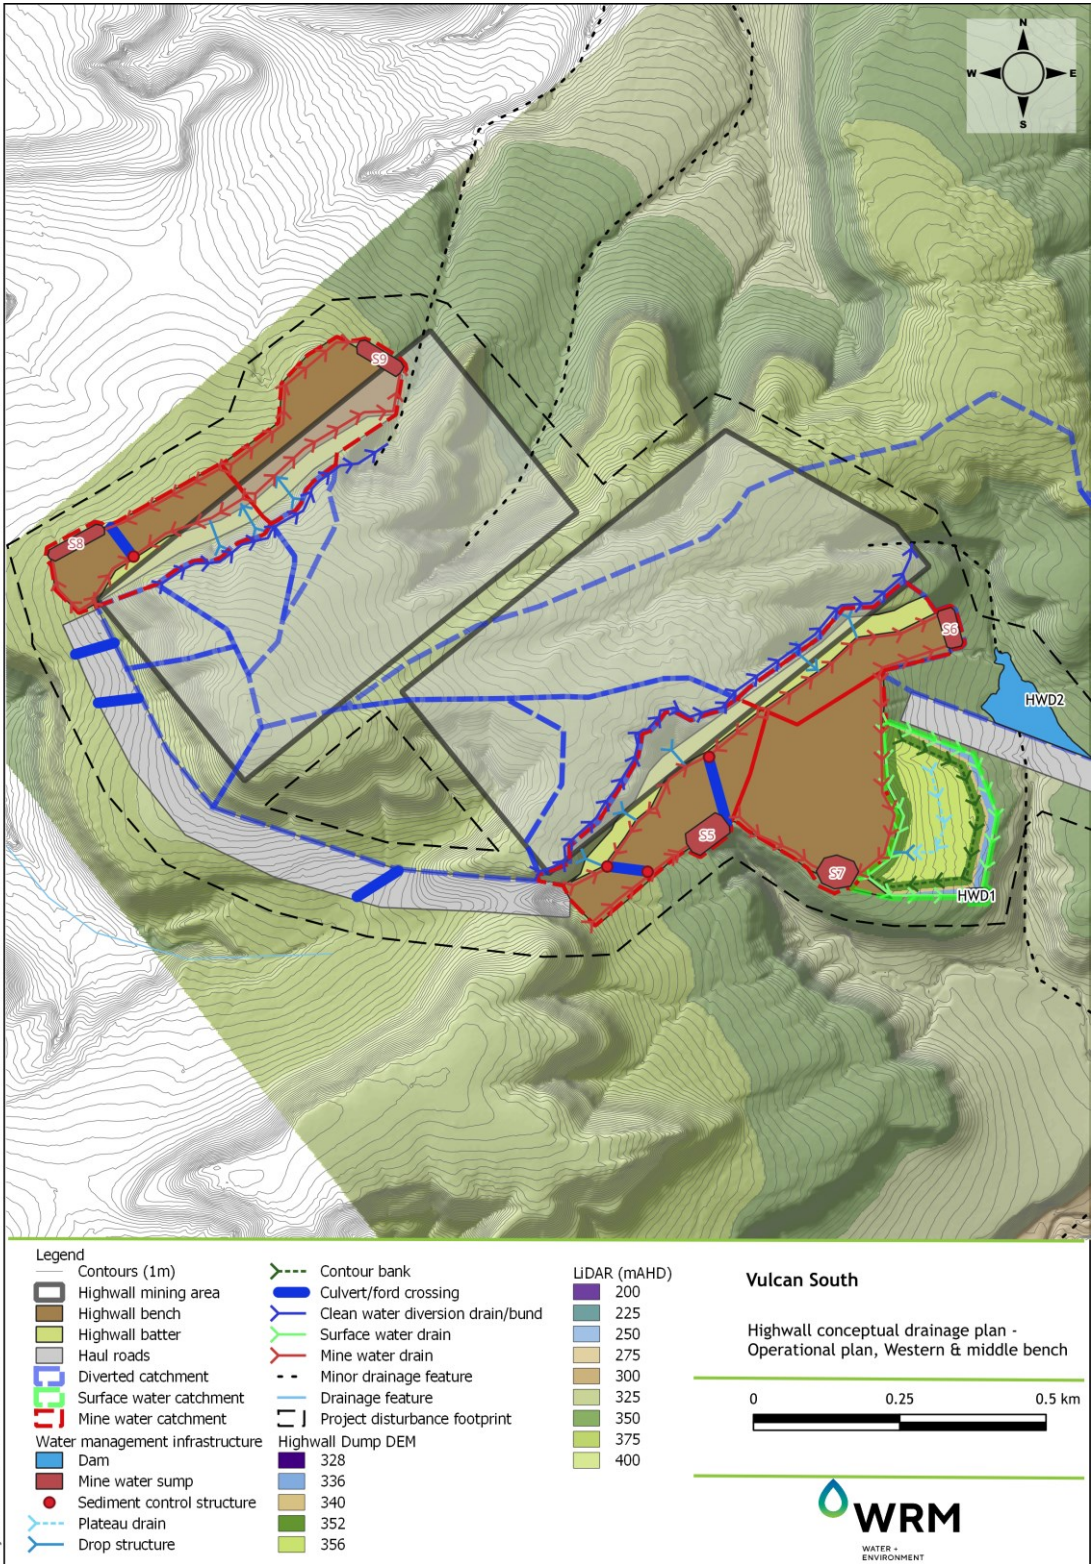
Highwall mining area west conceptual operational drainage plan
